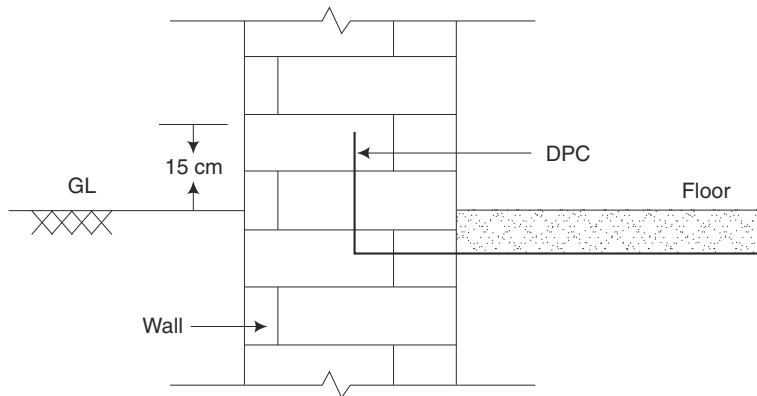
Damp-proofing for ground floor in level with ground surface
